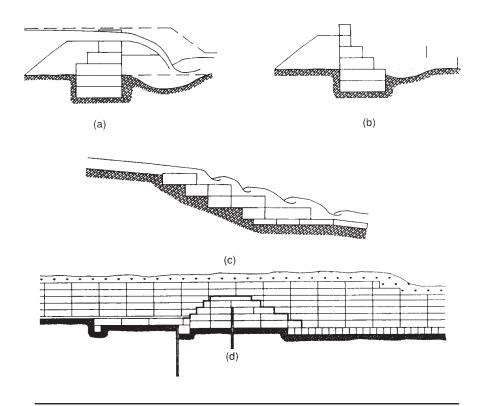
Typical gabion weir cross sections: a) vertical face; b) stepped face; c) long stepped; and d) sloped.
